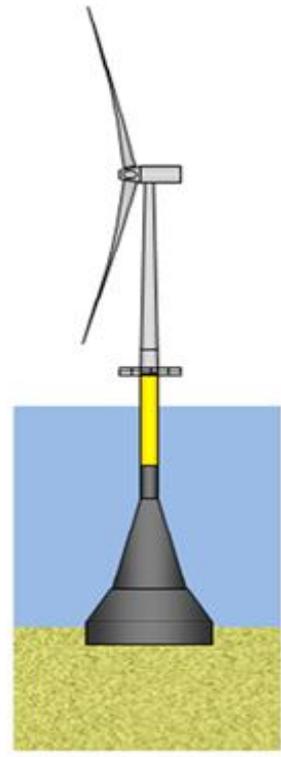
Outline Design of the Proposed Gravity Base Foundation
